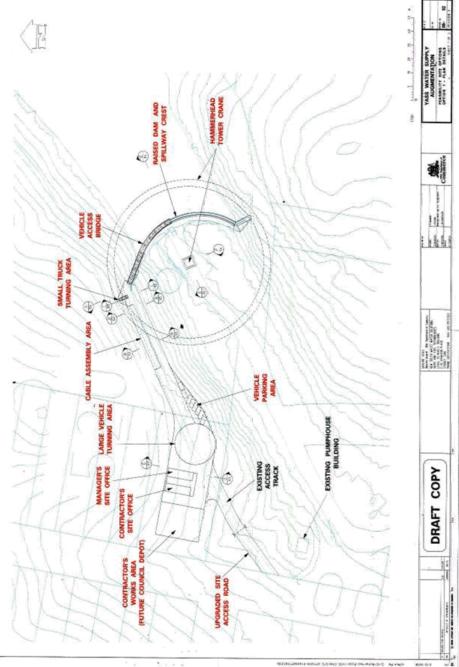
Proposed construction works area on west side of wall (supplied by DoC).
